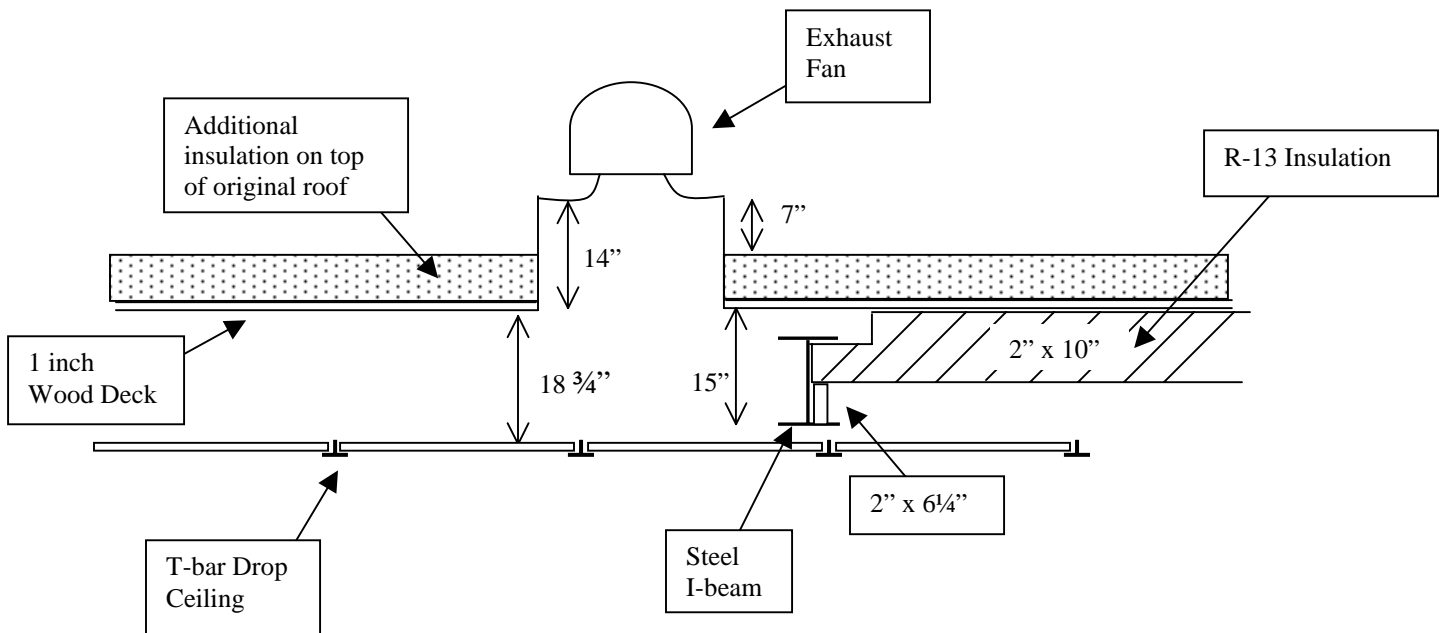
Second Floor Ceiling Construction Details (Site 15)
